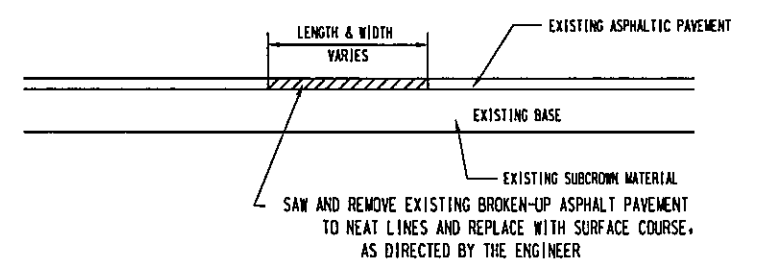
DETAILS OF REPAIRING EXISTING PAVEMENT PRIOR TO RESURFACING FOR FULL DEPTH AND MILLING
